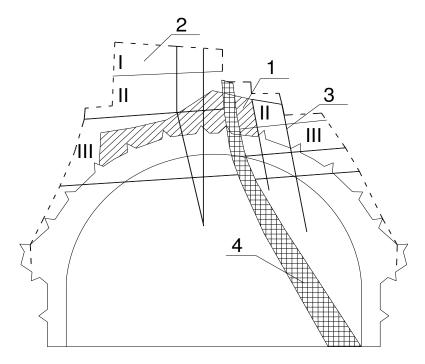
The collapse of the vault at the UH Cirkeisk tunnel: 1-collapse after the opening of the excavation, 2-collapse after the earthquake, 3-open cracks, 4-tectonic fault, I, II, III-clay layers.
